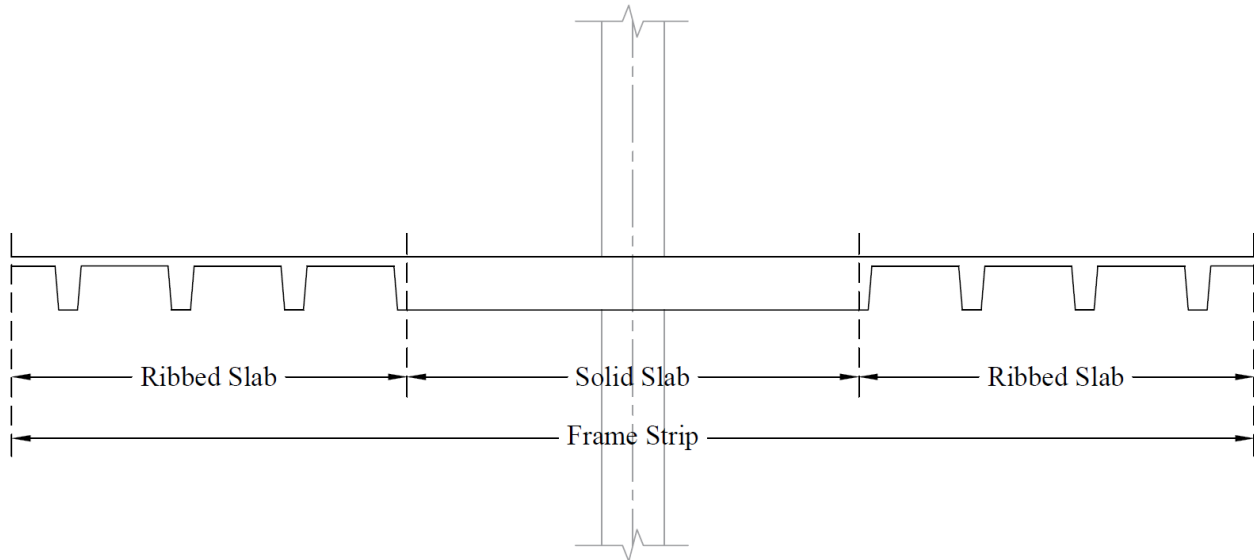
Frame Strip Cross Section (at Distance d from the Face of the Supporting Column)
